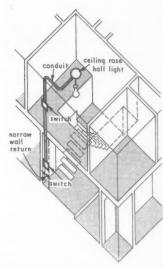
(above), routing of conduit between the two switches for the landing light.
